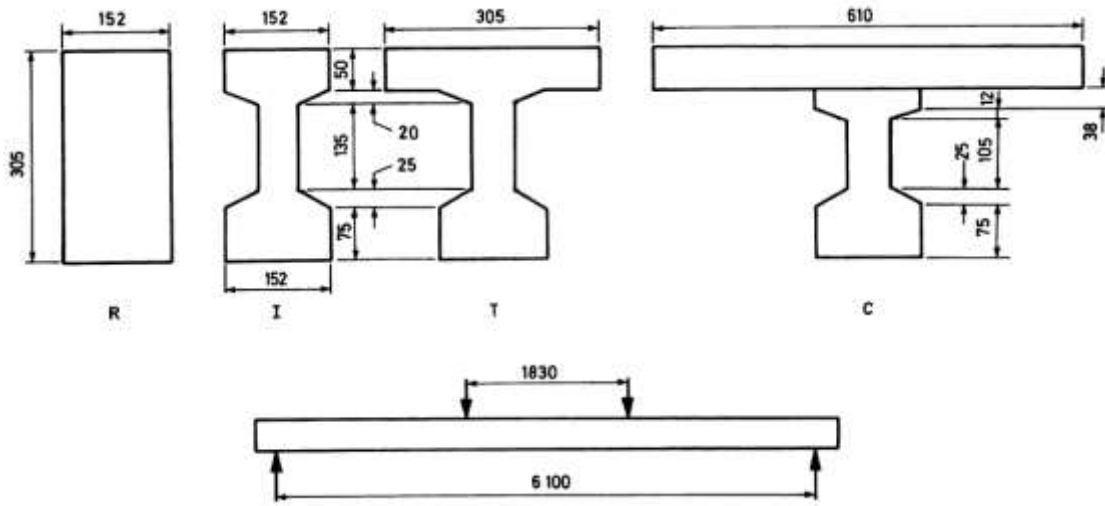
Cross section and loading arrangement of testing beams (Bennett and Veerasubramanian, 1972)
